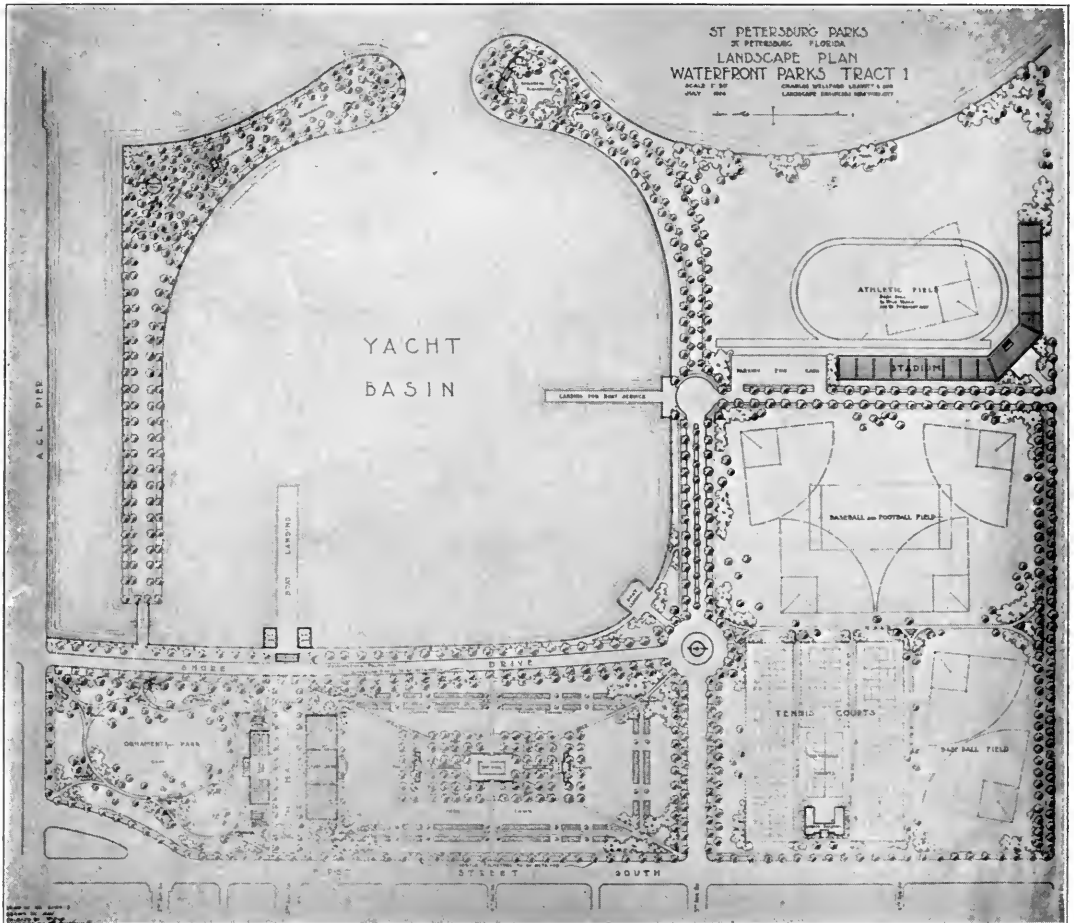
LANDSCAPE PLAN OF WATERFRONT PARK, ST. PETERSBURG, FLORIDA
